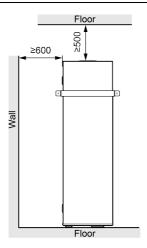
Installation diagram of the water tank (Unit: mm)
